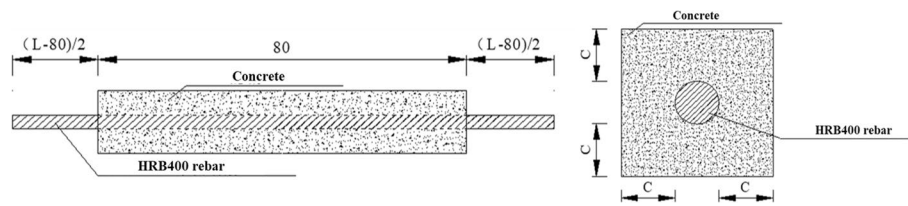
Schematic diagram of the dimensions of the reinforced concrete structure specimen
